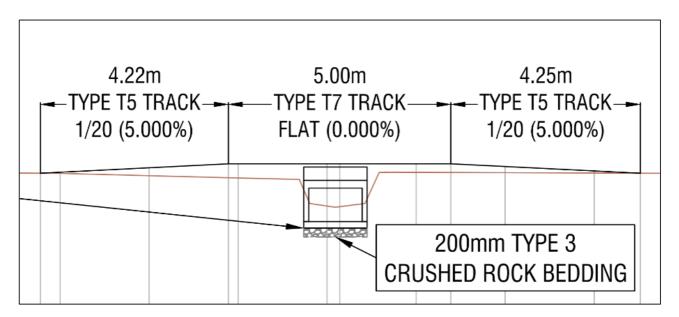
Cross-sectional view of typical detail for a box culvert design for a small channel
